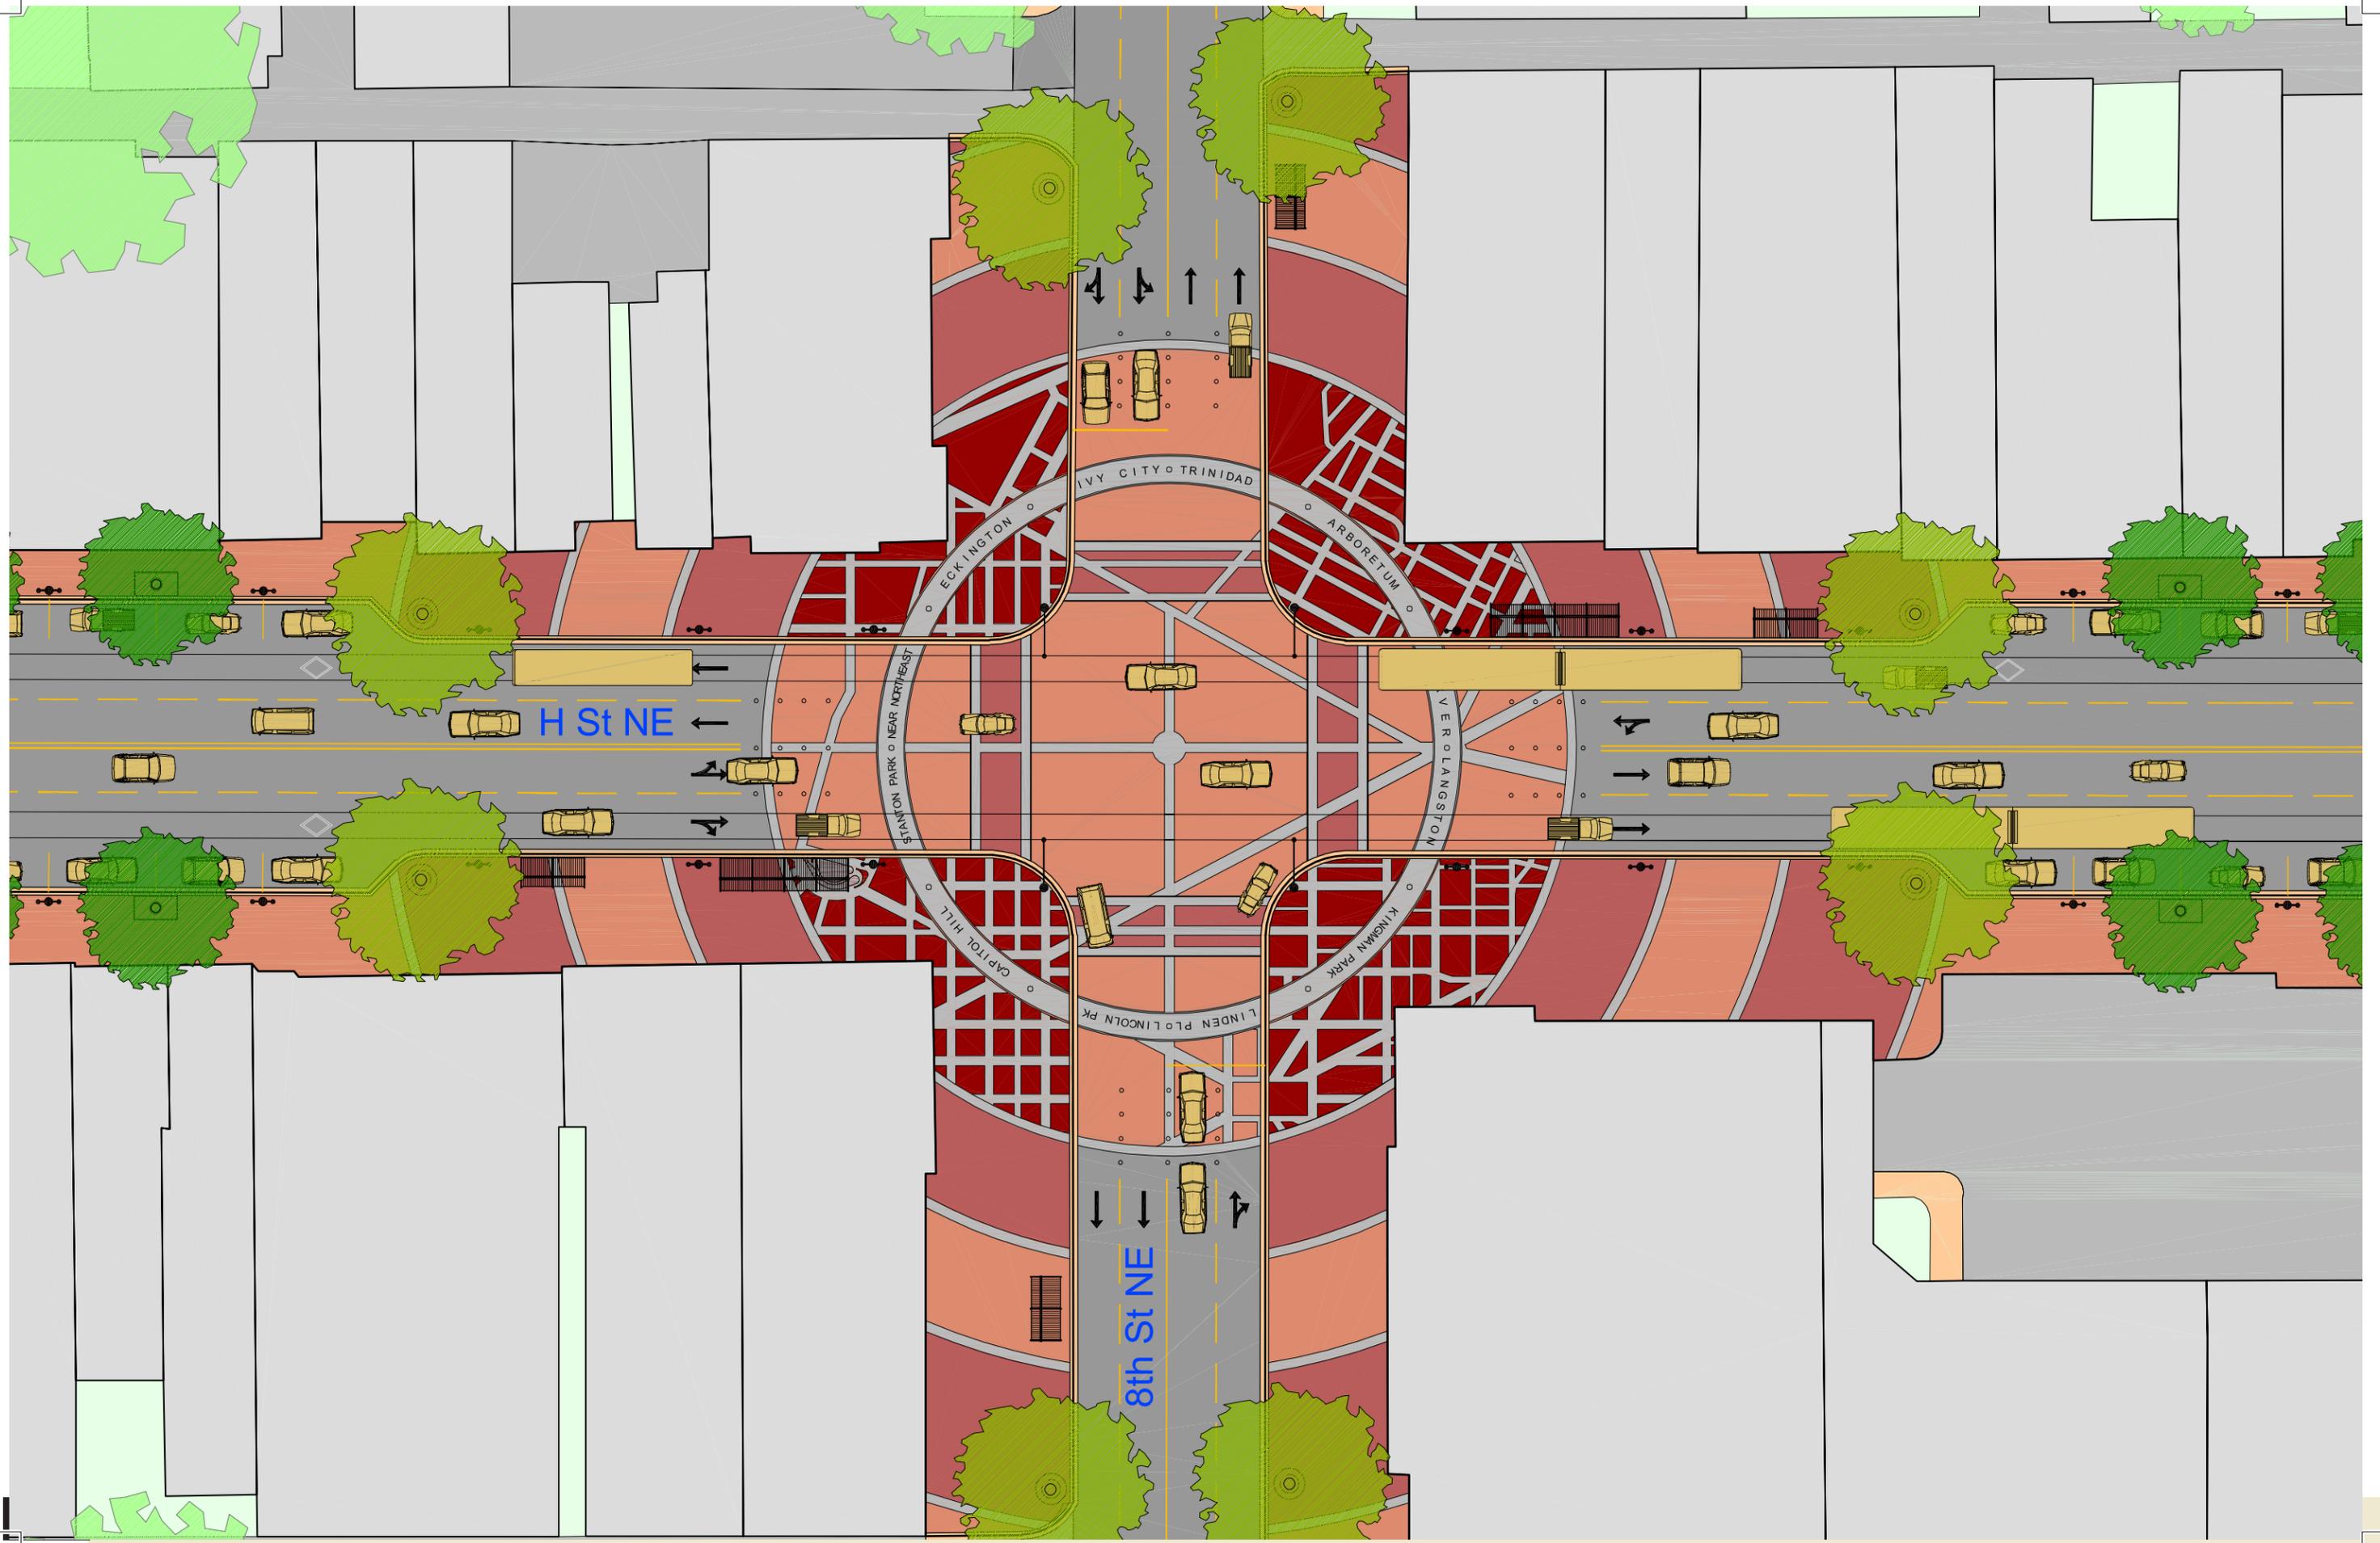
(opposite page): 8th and H Streets Intersection Design and Paving Pattern Detail
